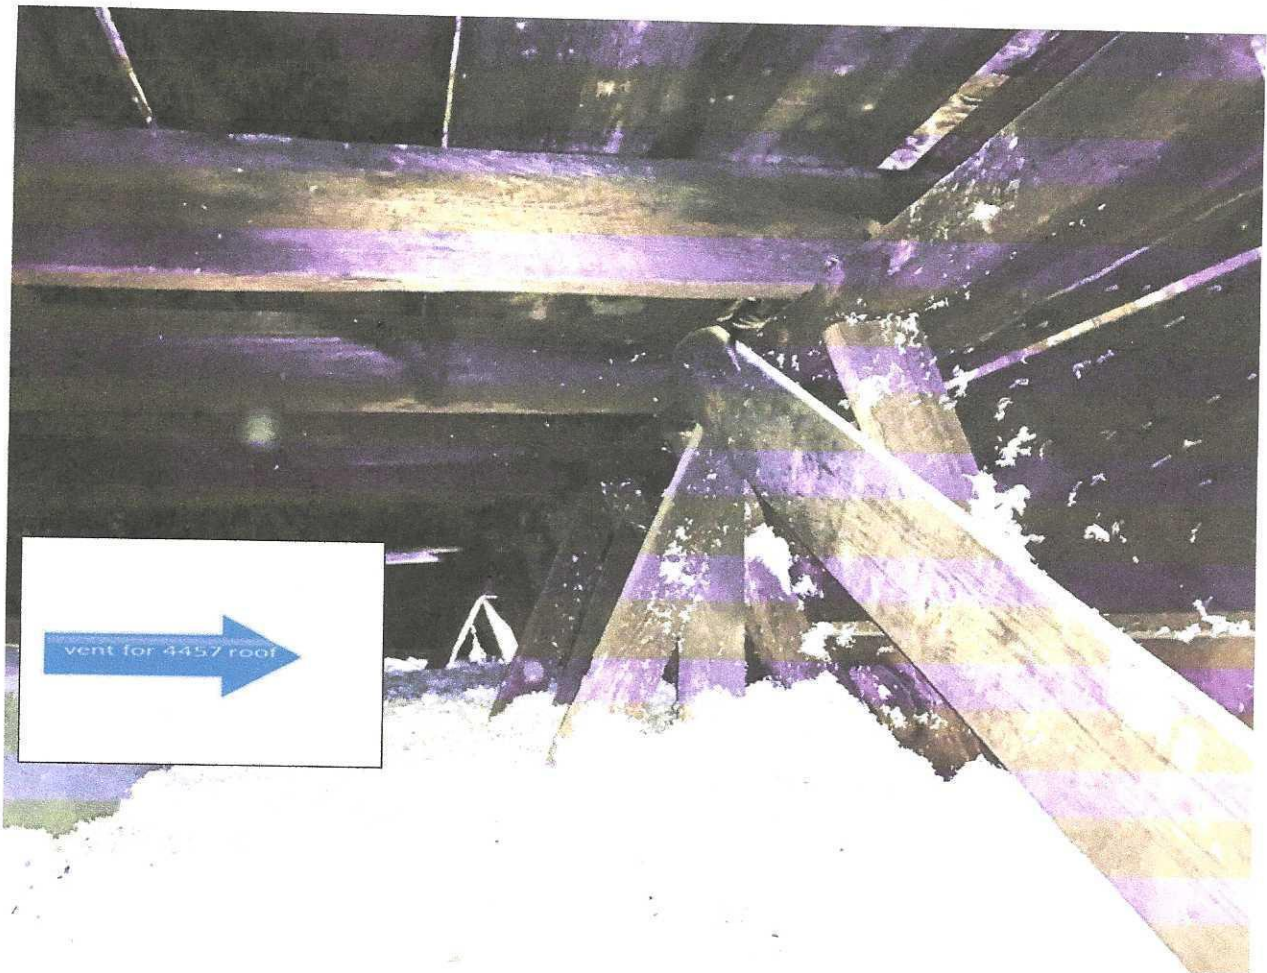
Common attic of 4457 – 4459 with arrow indicating the attic vent for 4457 when viewed through 4459 side of the attic.
